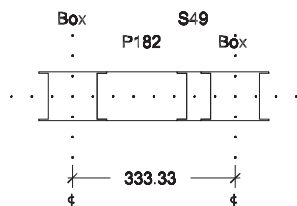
Typical Wall Adjustment using Spacer 49/Panel 182 combination
